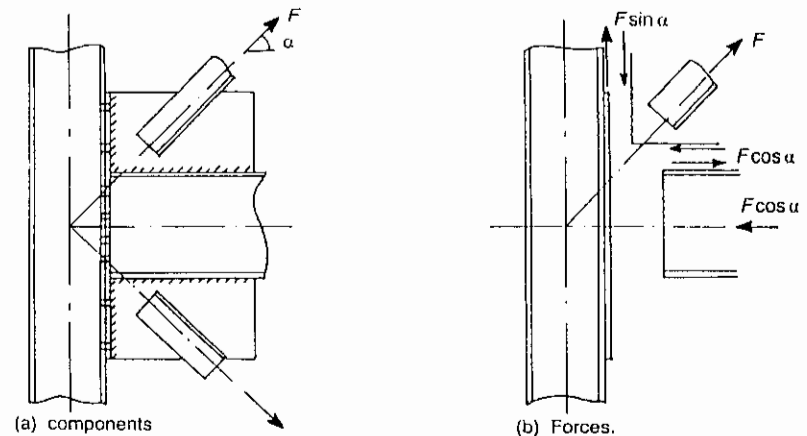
Bracing connection, (a) components, (b) forces.
